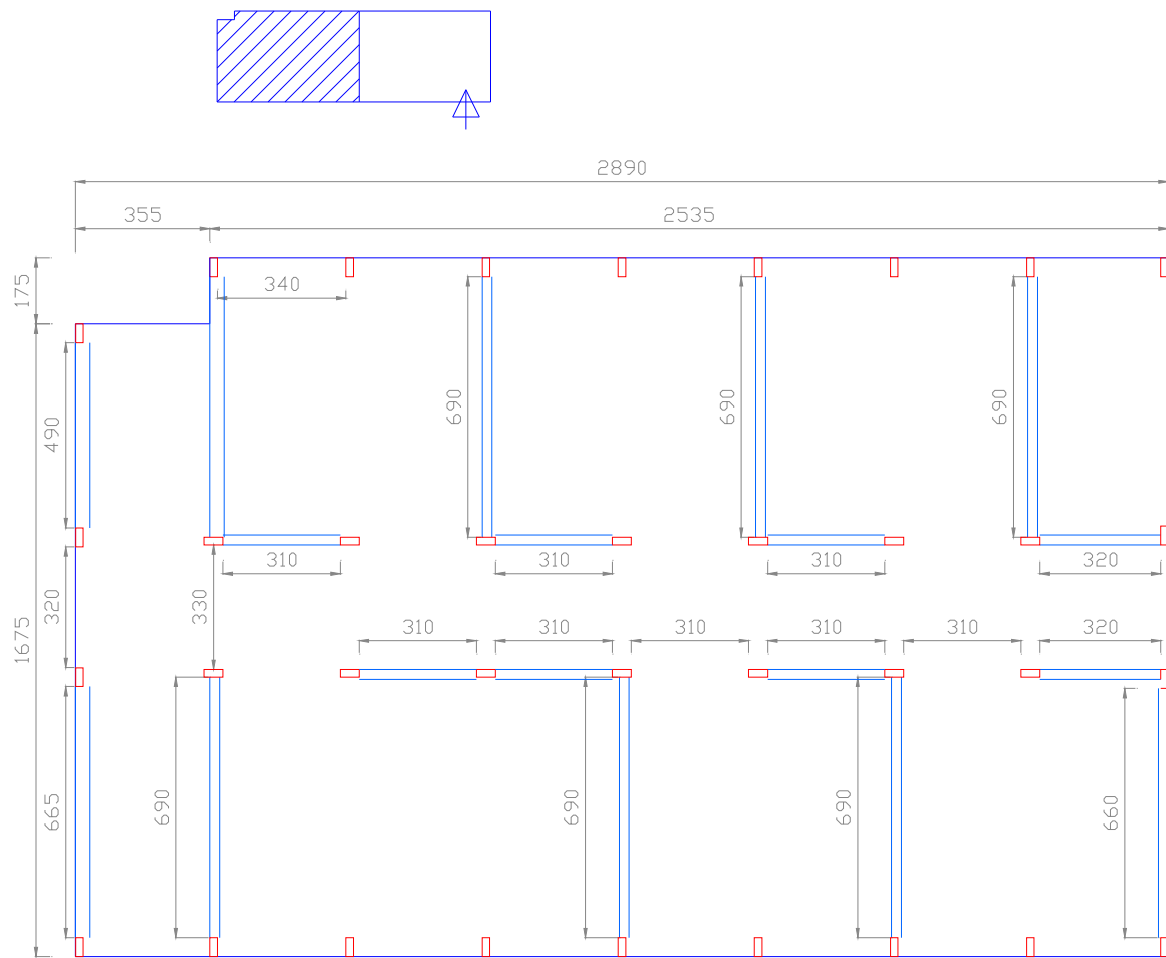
Typical school plan without shear walls. All the walls shown in the drawing refer to those occupying a full span. Walls with openings are excluded. All the columns have dimensions of 0.3m x 0.5m. The arrow indicates the entrance to the building. Dimensions are in cm.
